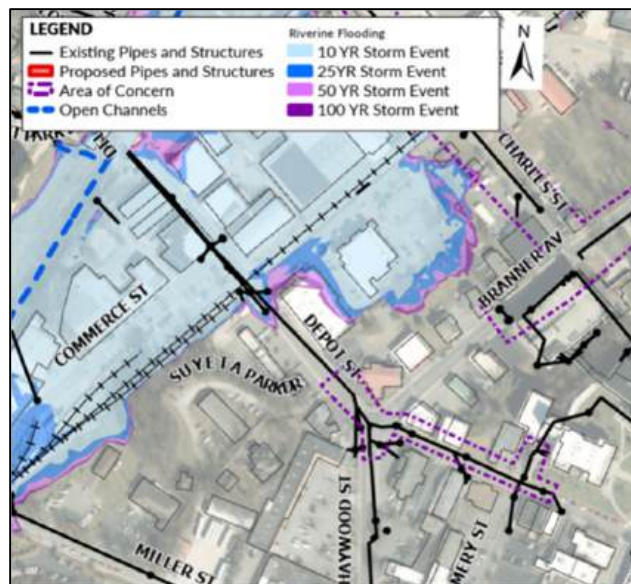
Concept Project Area 5 – North Haywood Street and Depot Street
